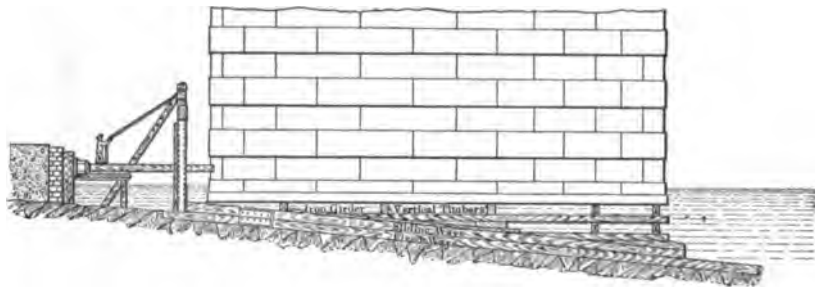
LAUNCHING WAYS, FORTH BRIDGE CAISSONS.
